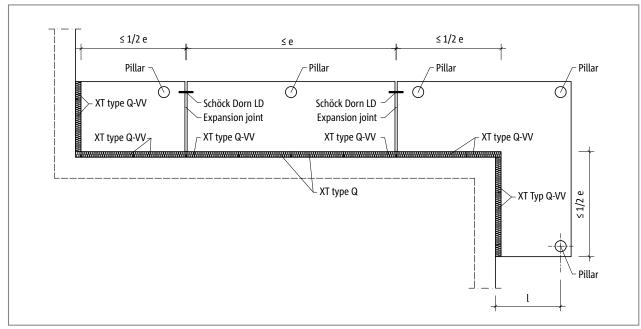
Schöck Isokorb® XT type Q, Q-VV: Expansion joint arrangement
